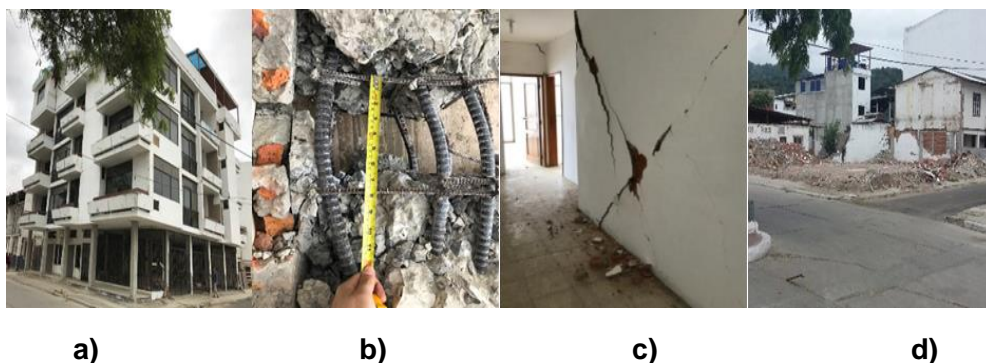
(a) The Cevallos building of 5 floors of reinforced concrete. (b) The formation of kneecaps repeats itself in 7 columns of ground floor in the facade posterior of the building; (c) Cracking of masonry they change according to the level of floor; (d) Demolished structure.
